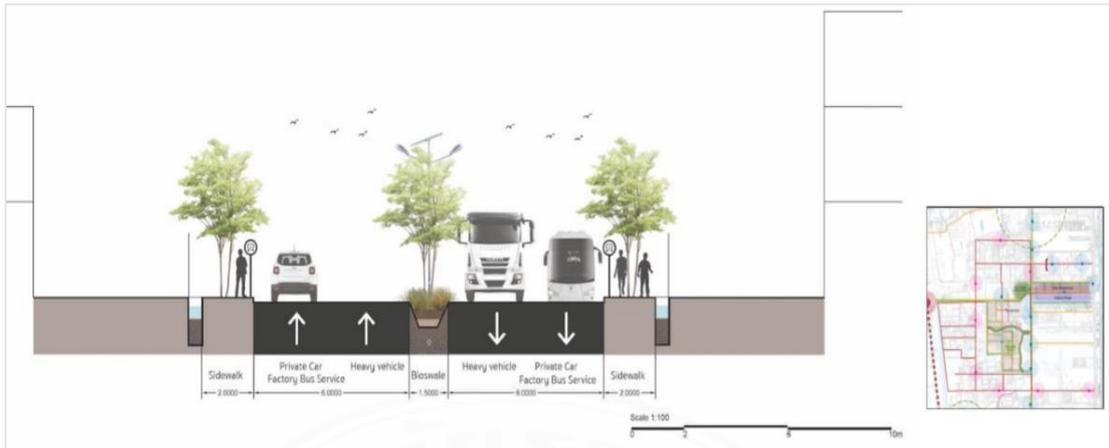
Section C-C': Heavy and light route in Nava Nakorn 5 road
